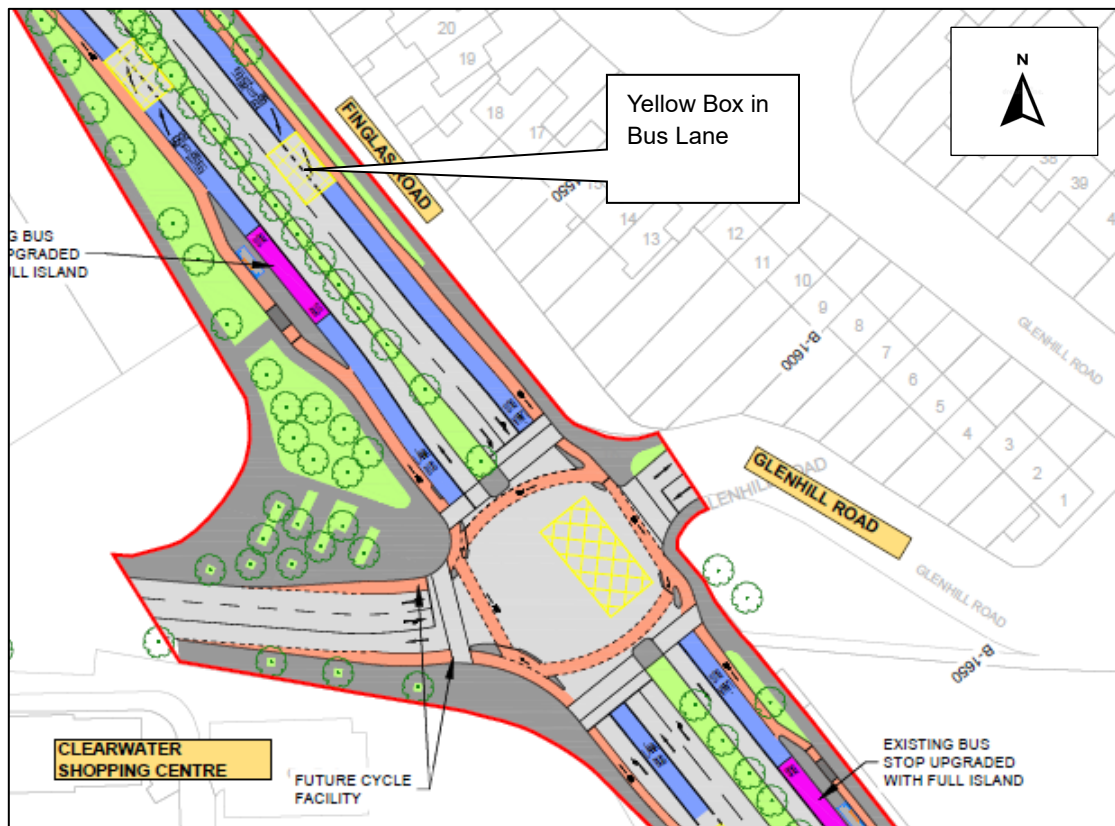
Extract from General Arrangement Drawing Sheet 29
